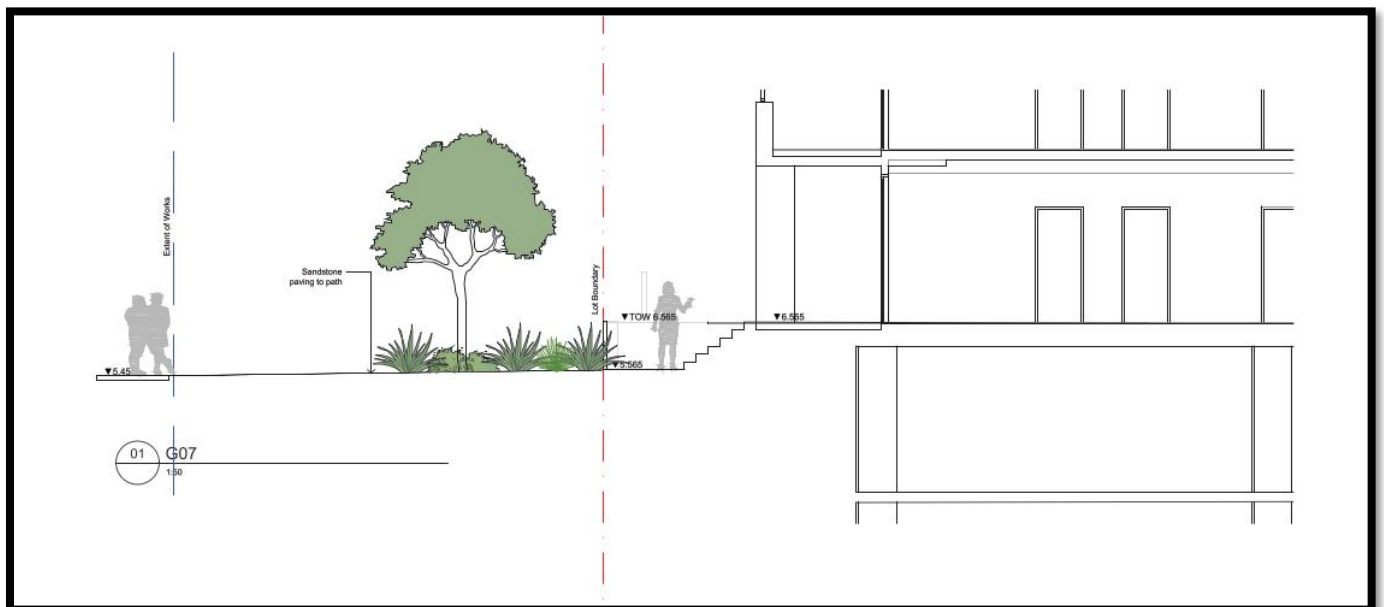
Section detailing pedestrian access to apartment 7 from public foreshore
